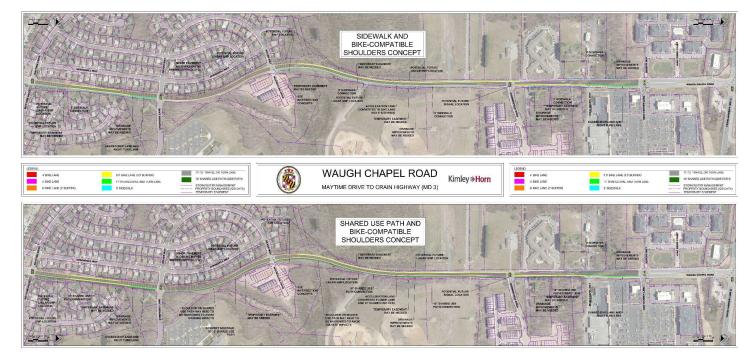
Sidewalk, Bike Lane and Shared Use Path Concepts
